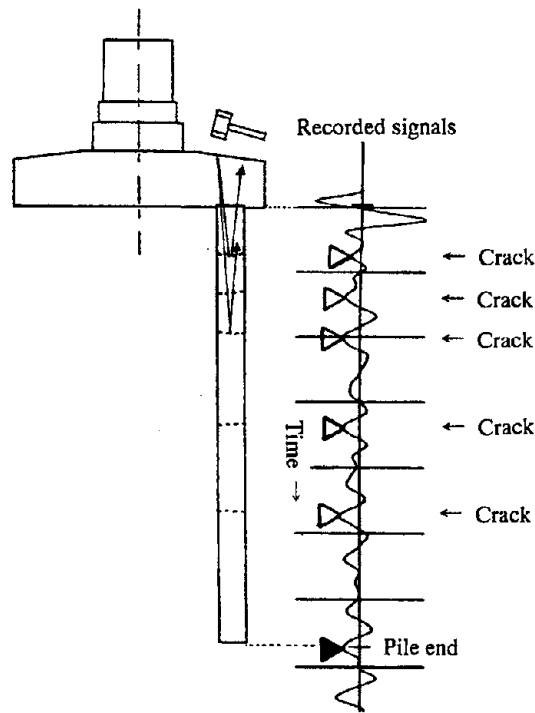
Nondestructive inspection (Pile integrity test)
